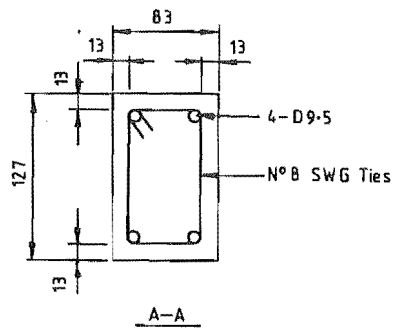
BEAM REINFORCING DETAILS FOR FRAME-WALL SPECIMENS
